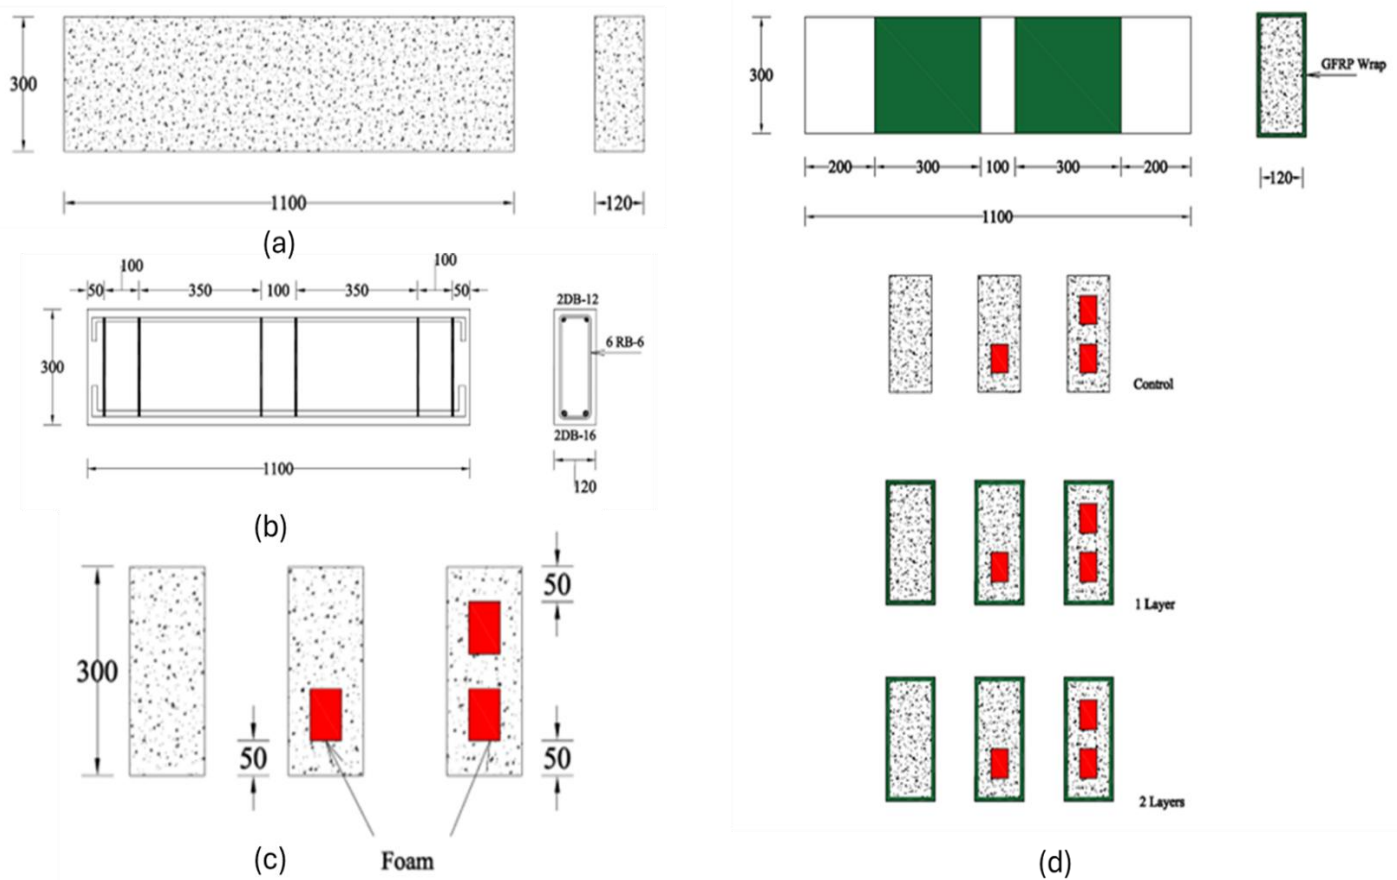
A typical deep beam with: (a) beam details and (b) steel bar details, (c) opening details, and (d) strengthening details. (Units are in mm).
